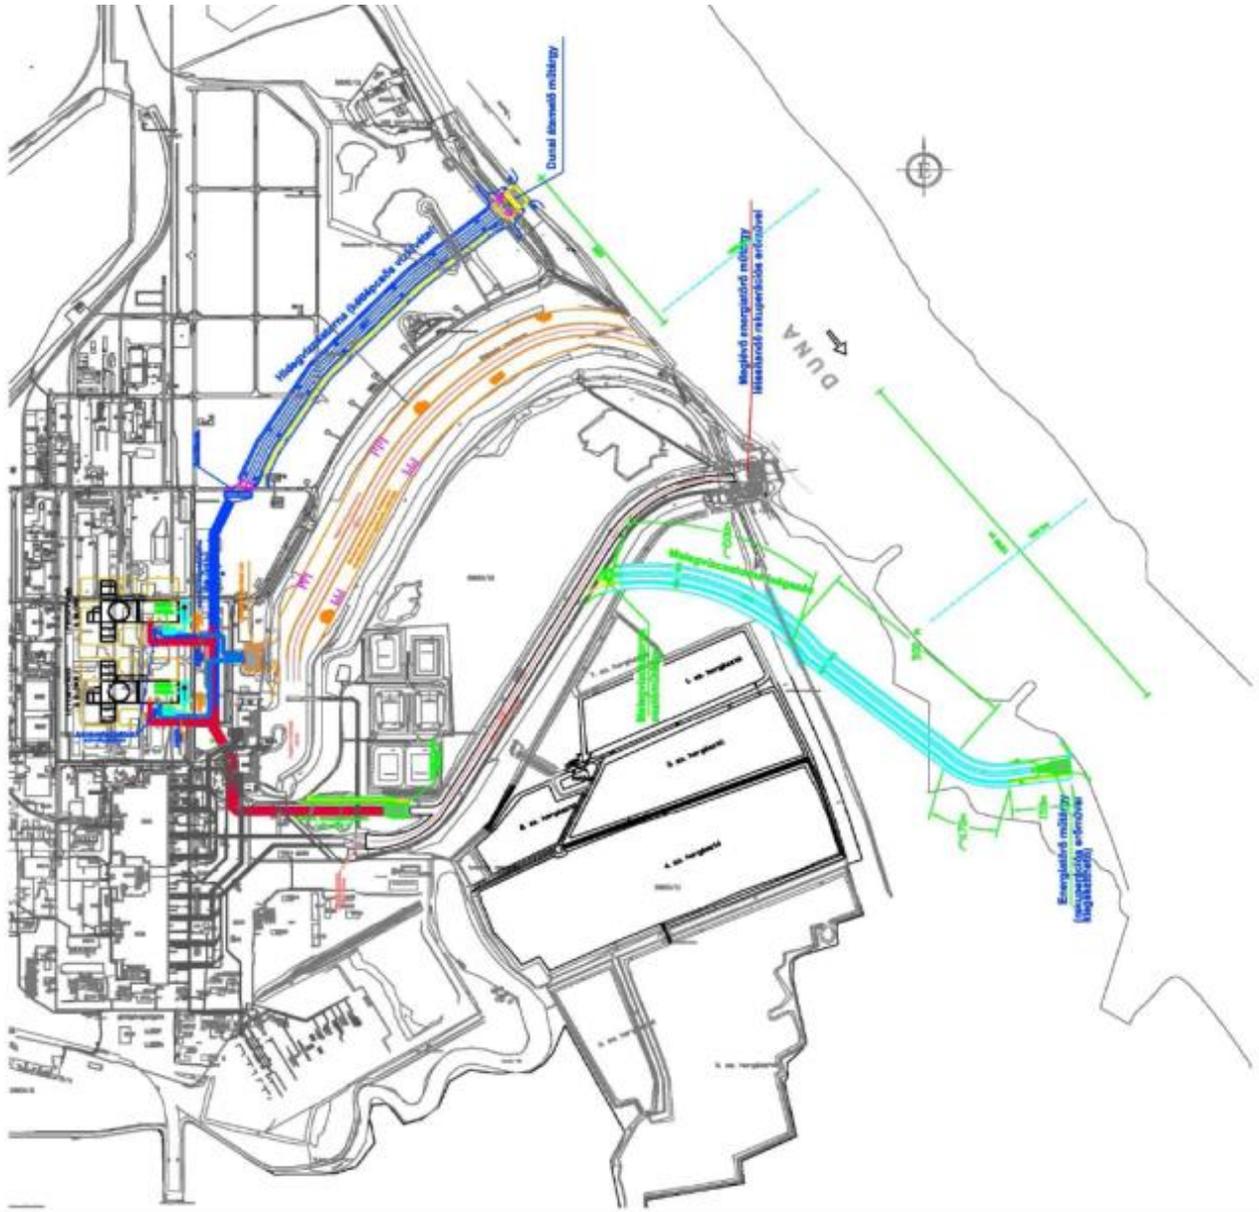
Two stage fresh water cooling system – layout [5-3], [5-4]
